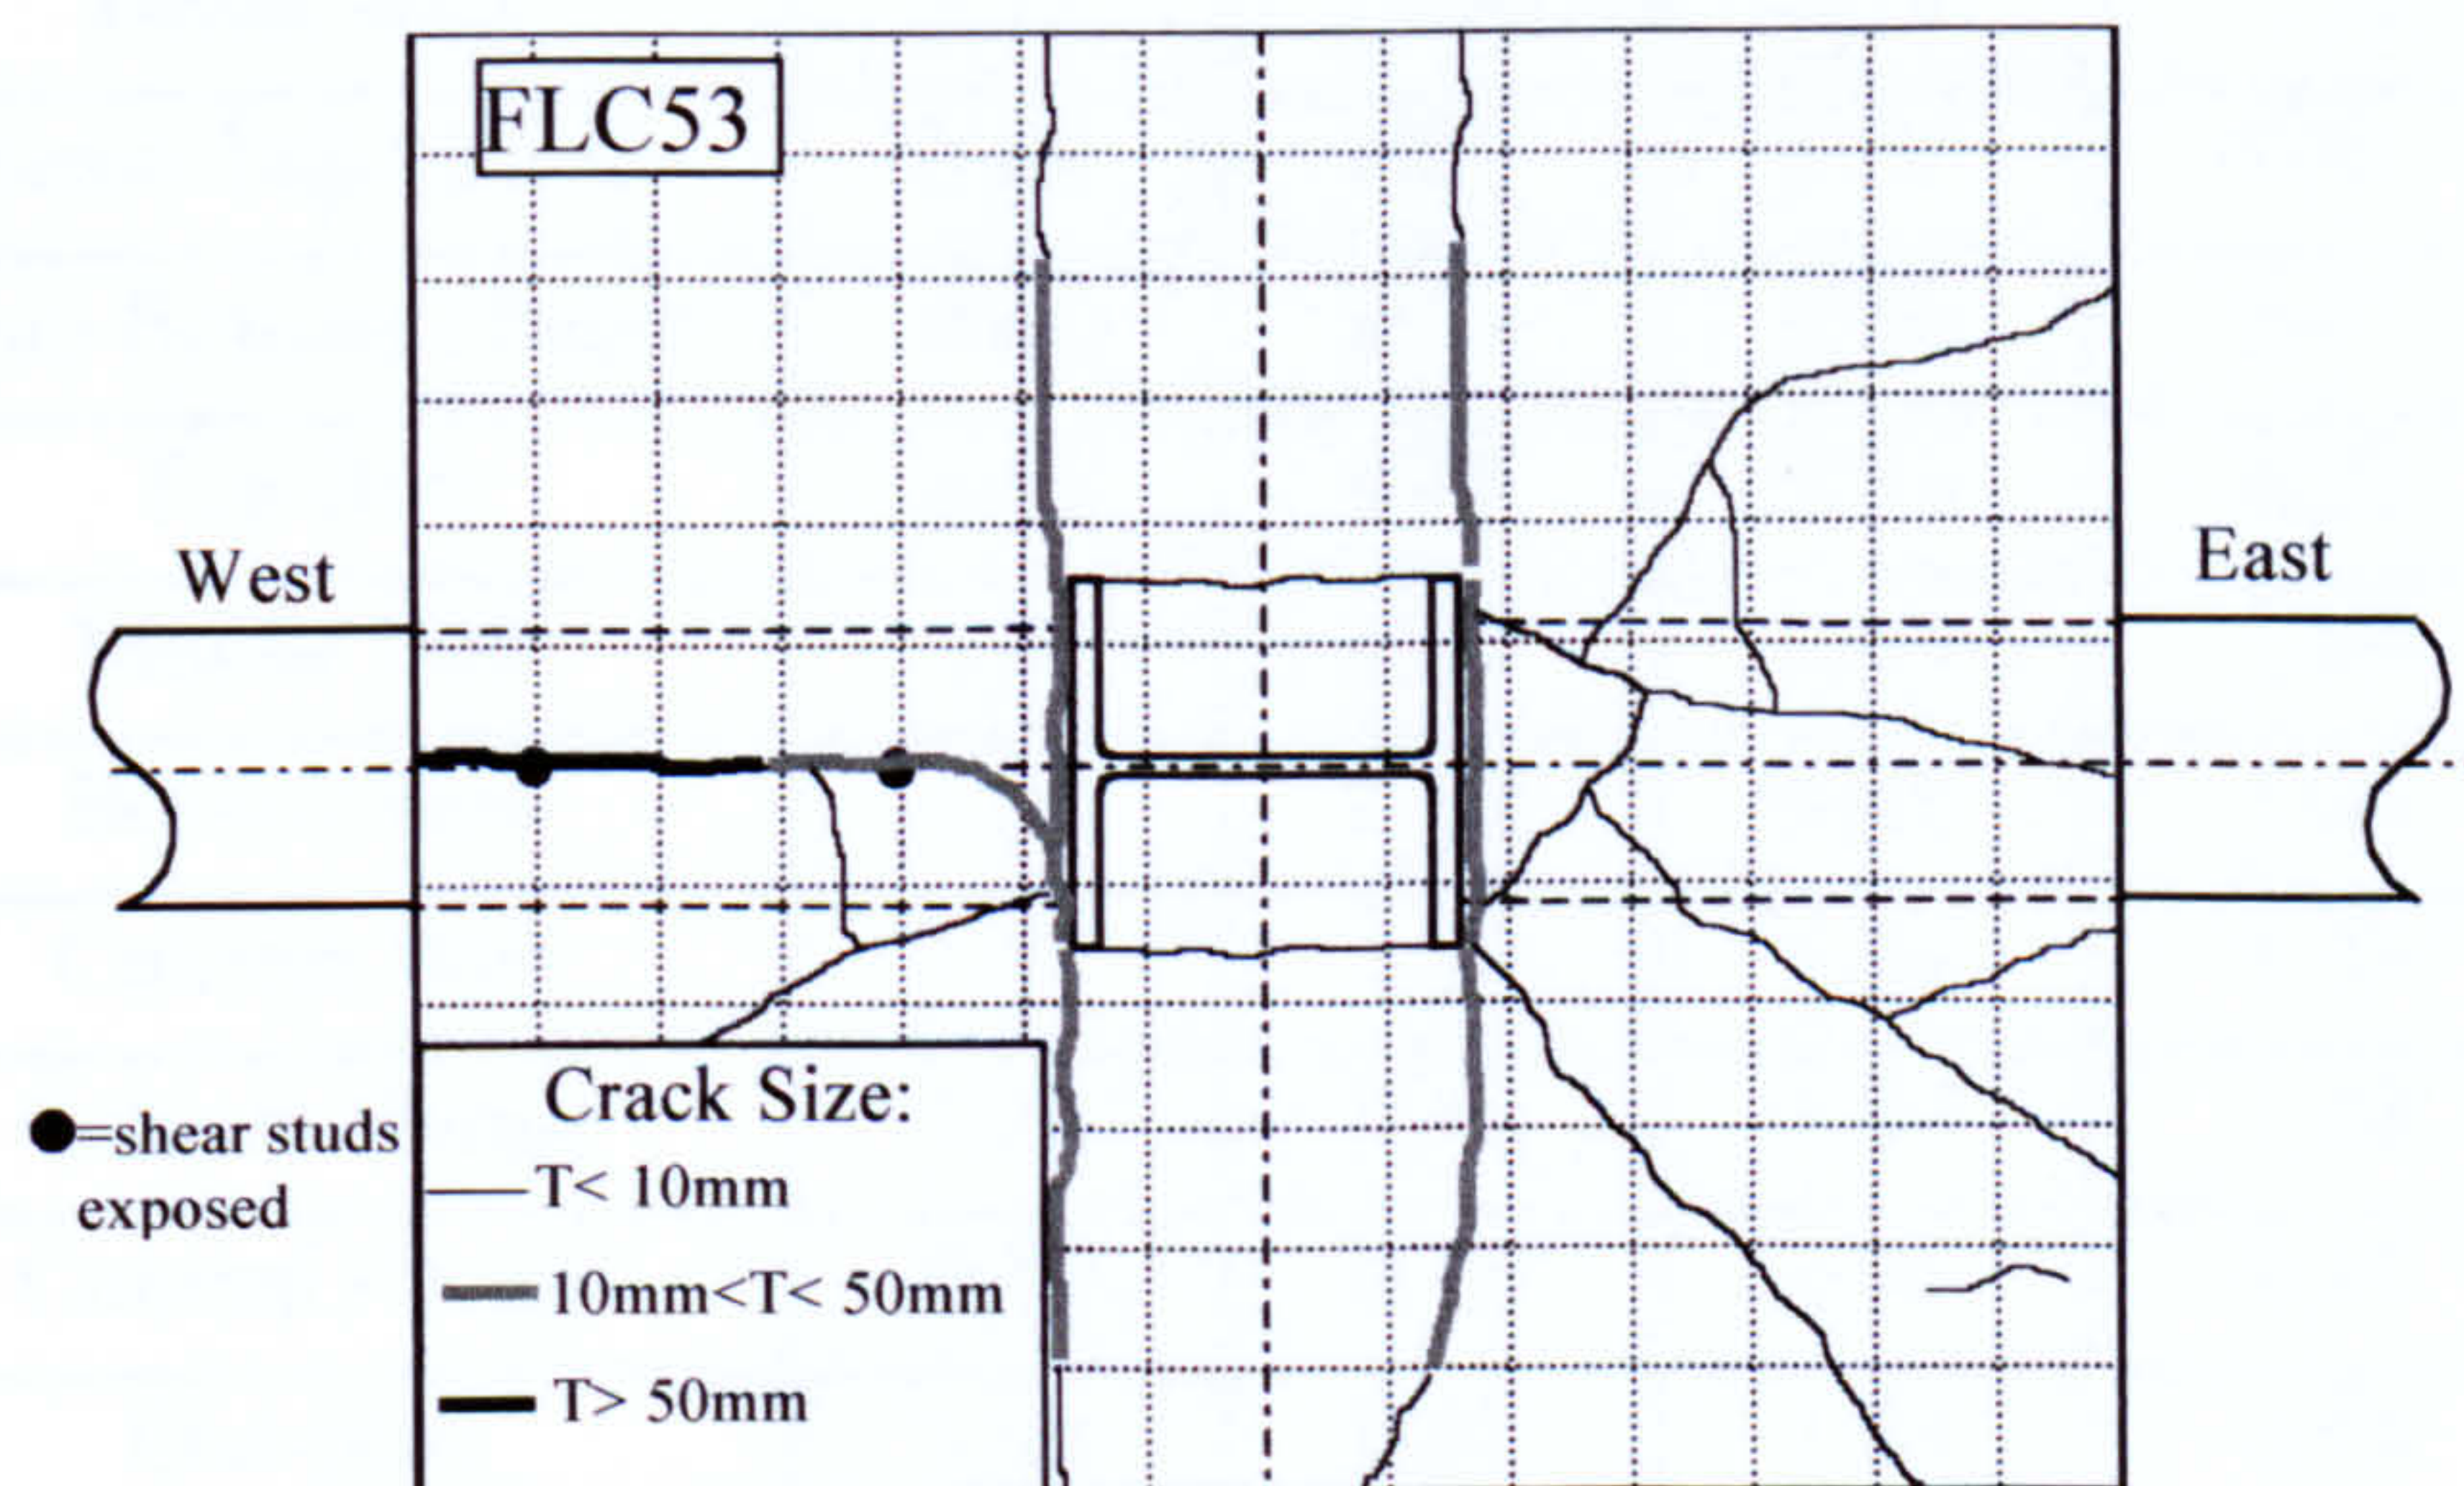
Typical Slab Crack Locations in Group 5 Tests
